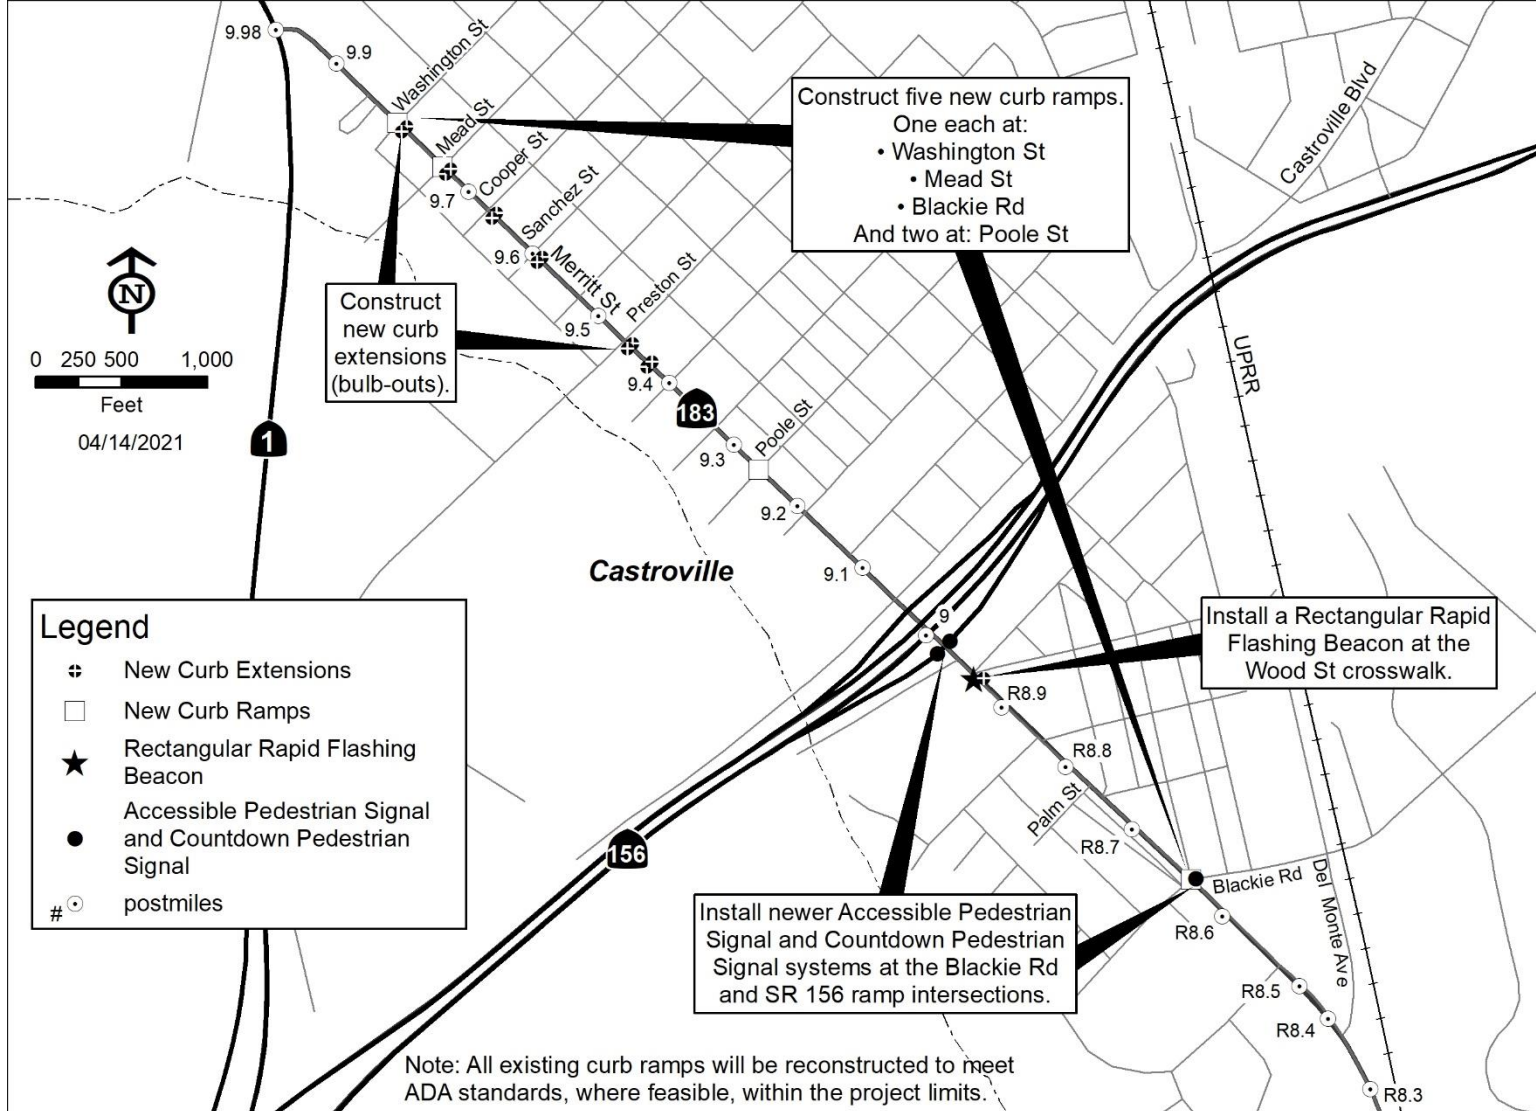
Curb Ramps, Curb Extensions, and Pedestrian Crossing Facilities
